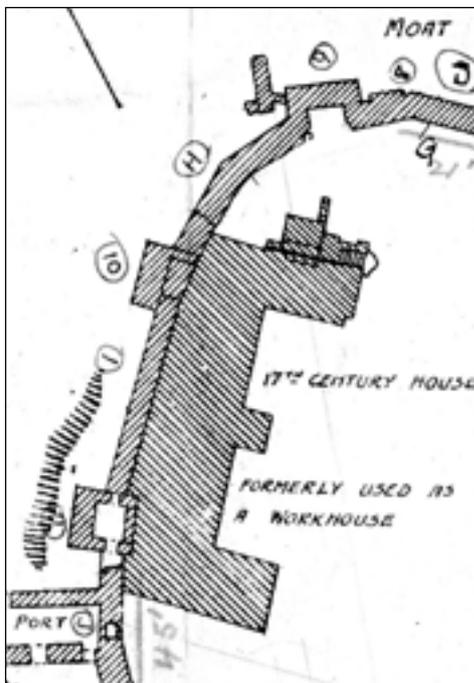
(left) Detail of site plan of Framlingham Castle dated 1919, showing the outline of ancillary structures on the north side of the north range. (TNA WORK 14/685)
